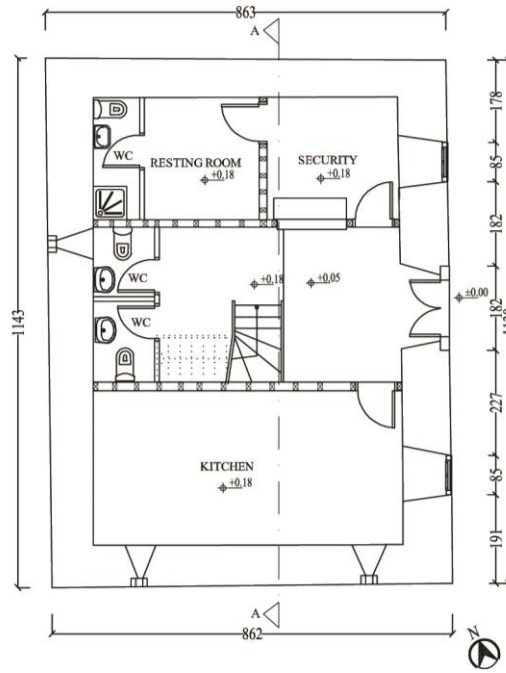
Ground floor plan of Ankara Bağ Evi in 1/100 scale (Redrawn by author).
